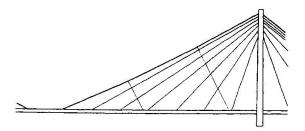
Secondary stabilizing cables stressed against the top stay cable
